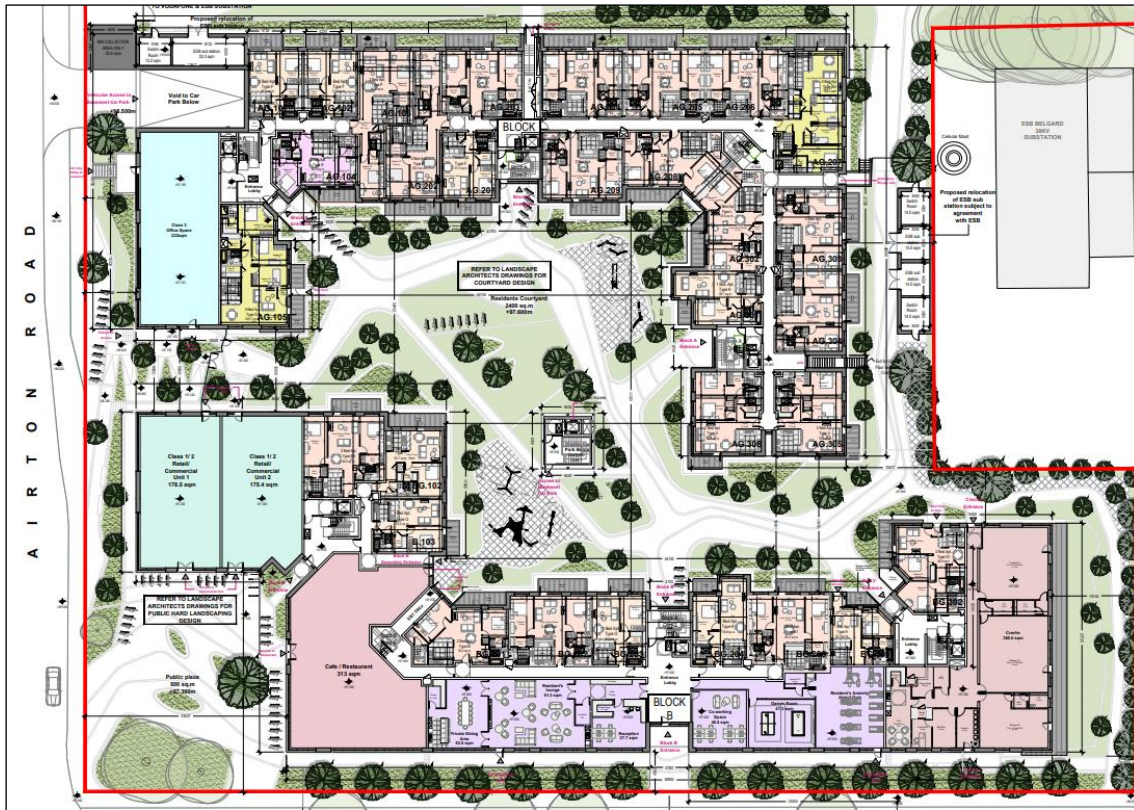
Ground floor layout plan approved under ABP Ref. ABP-305763-19
